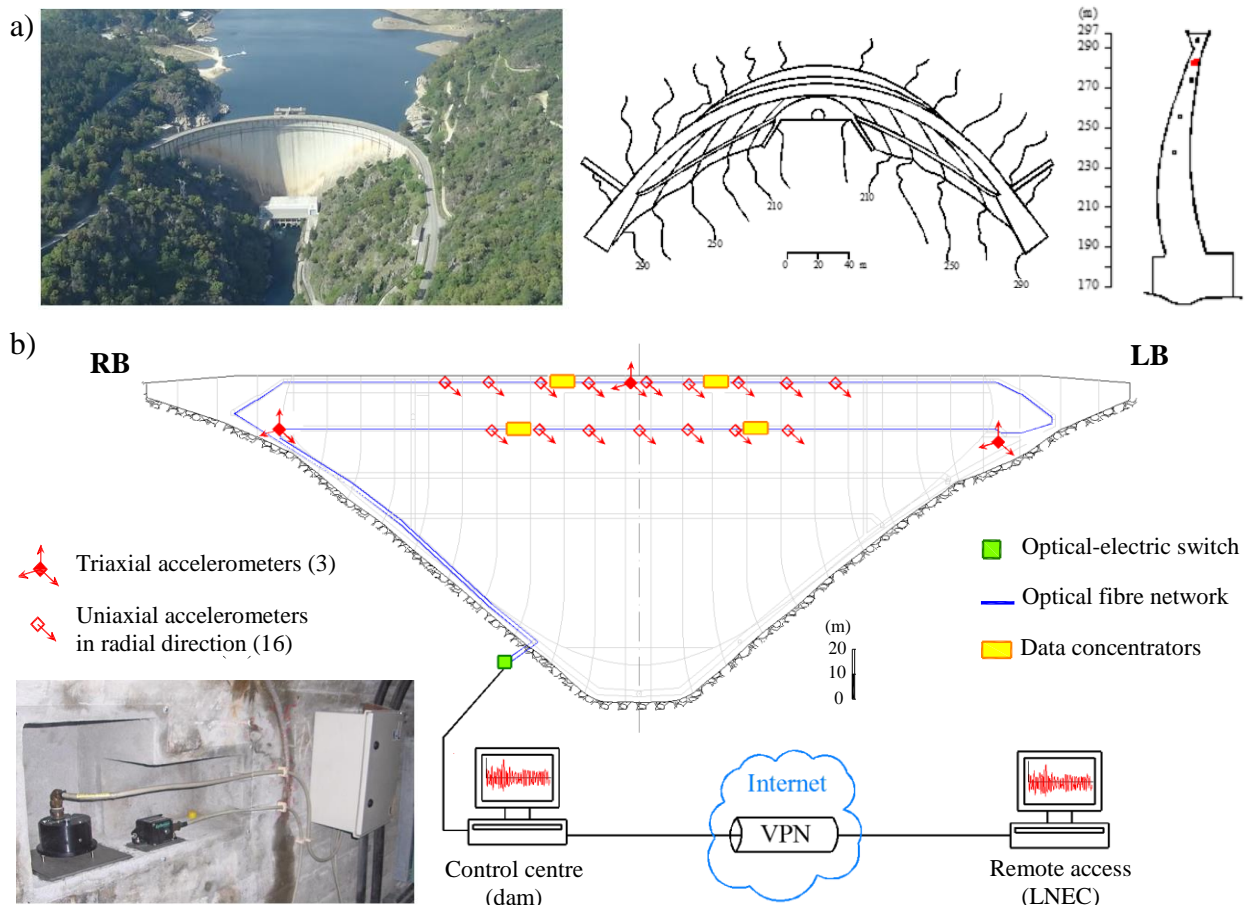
Cabril dam: a) aerial view, plan view and central cantilever cross section; b) front view and SSHM system (main hardware components)
